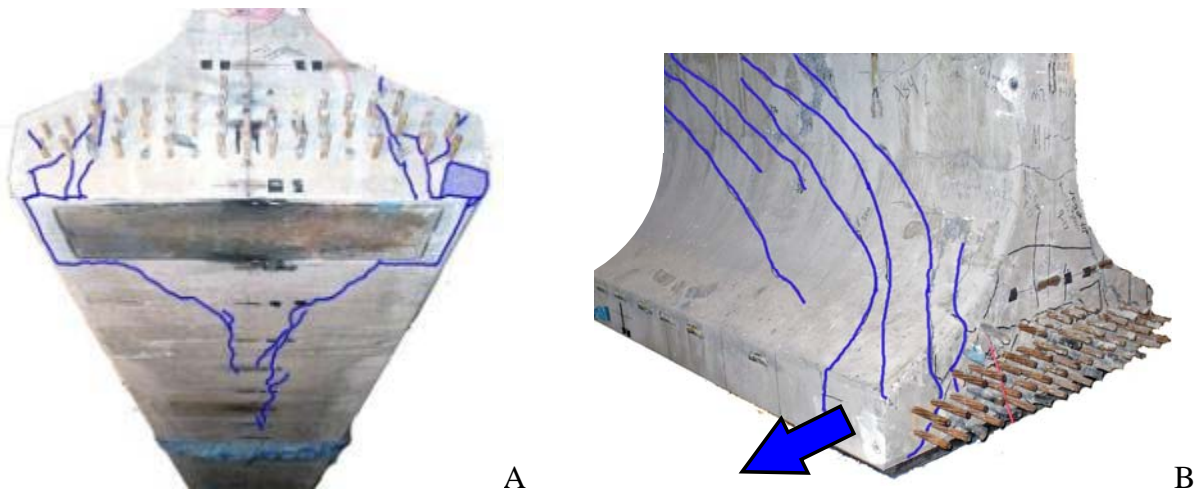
Lateral-splitting failure A) bottom view and B) side-end view
